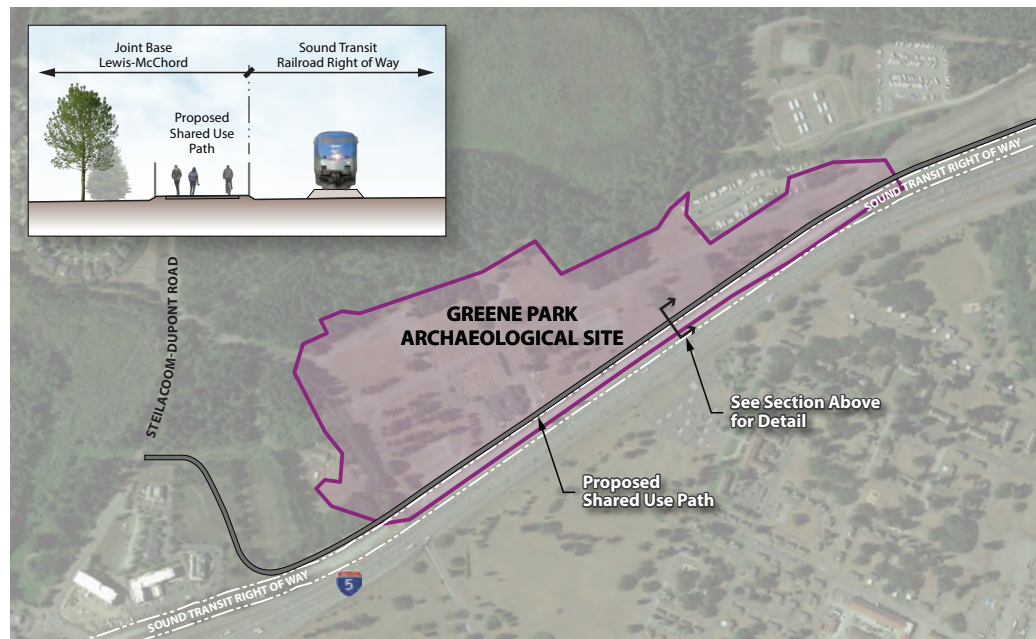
Shared Use Path Alignment on Greene Park Archaeological Site
